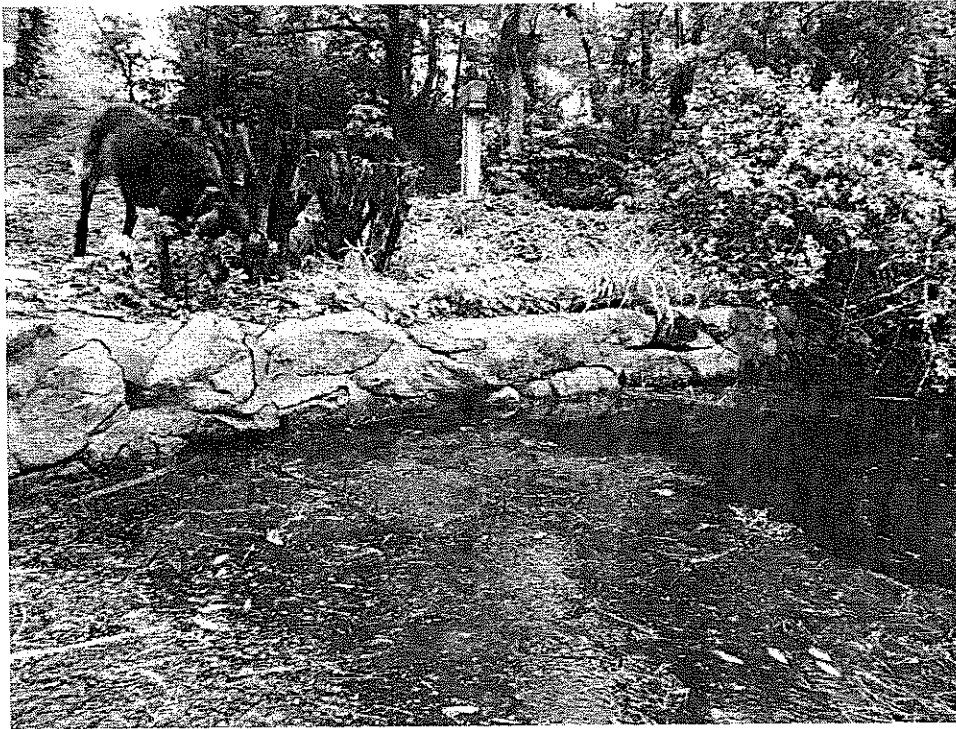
View of right stone masonry wall, facing southeast; note overgrown vegetation and deteriorated motor joints.
